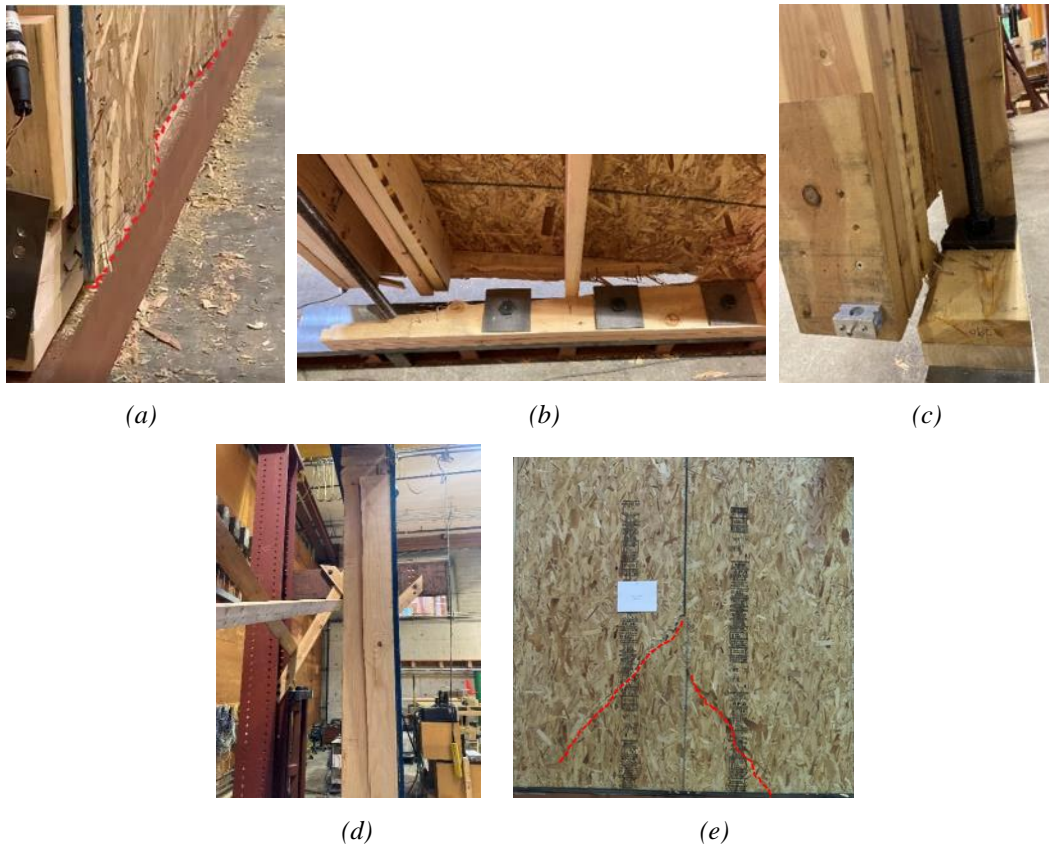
Failure modes: (a) Sheathing buckling [13], (b) Bottom plate splitting [14], (c) End stud separation from bottom plate [14], (d) End stud splitting, (e) Sheathing rupture under tension and compression.
